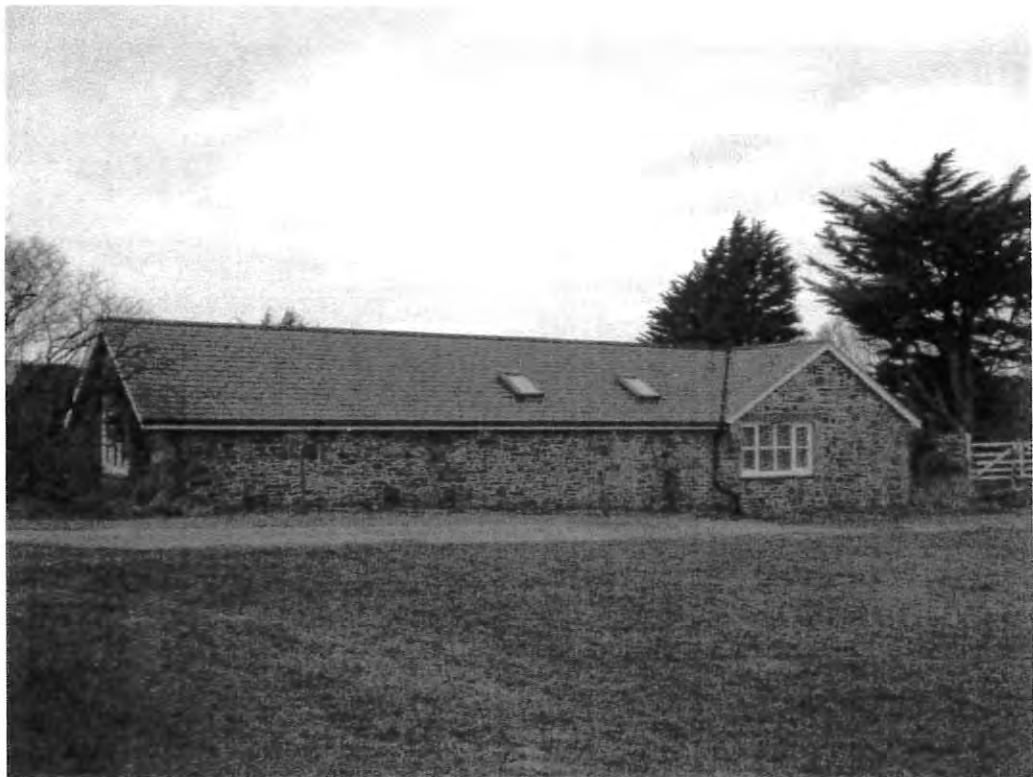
East elevation of building 04 The Old Shippen, brick corbels to the northern gable retained and a window placed in the wide doorway that was previously in the north gable, see figure 47.
